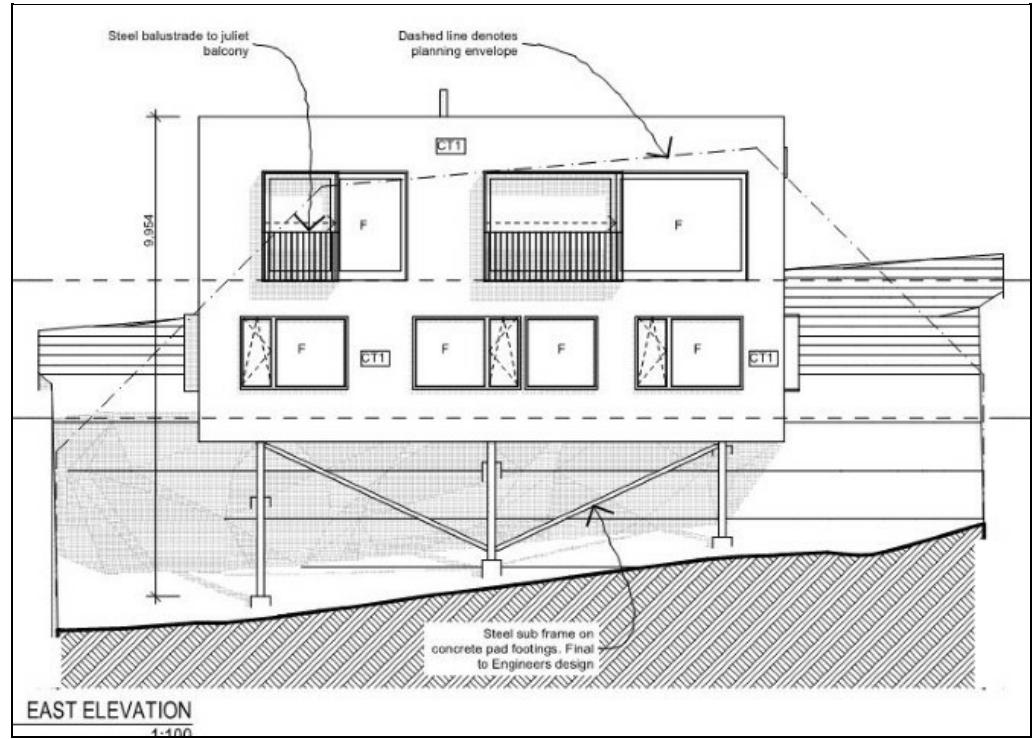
Excerpt from submitted project 1819-14 drawing 201 (14/3/19) showing building envelope over building, east / downhill side elevation.
